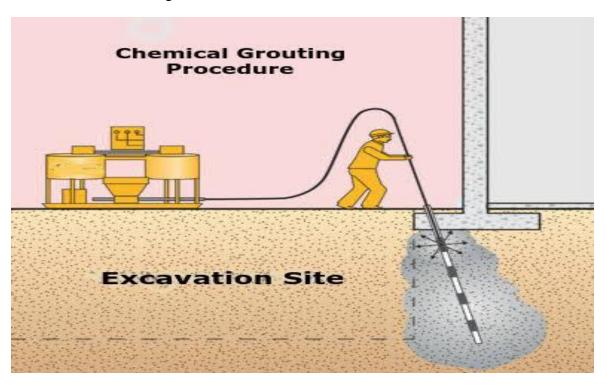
An Image Showing Chemical Grouting Procedure (SOURCE: GS) foundationrepair.com)
